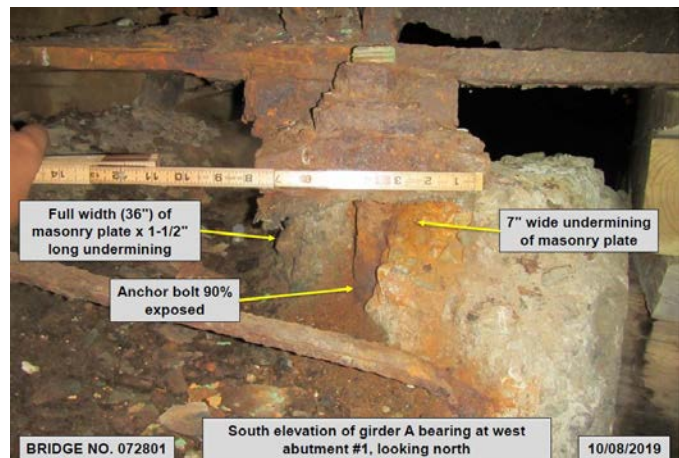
DAMAGE TO THE CRANSTON PARK EAST BRIDGE
